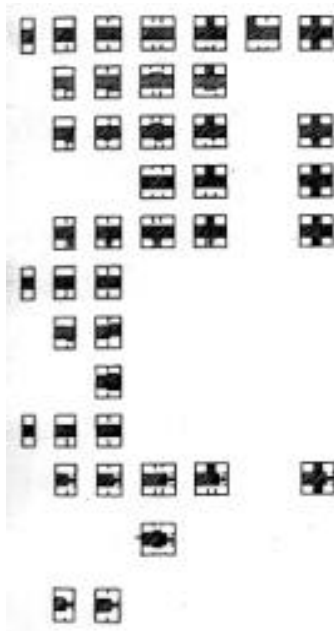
The Matrix of Planimetric Organizations of the 'Turkish house: plan type with an inner sofa
